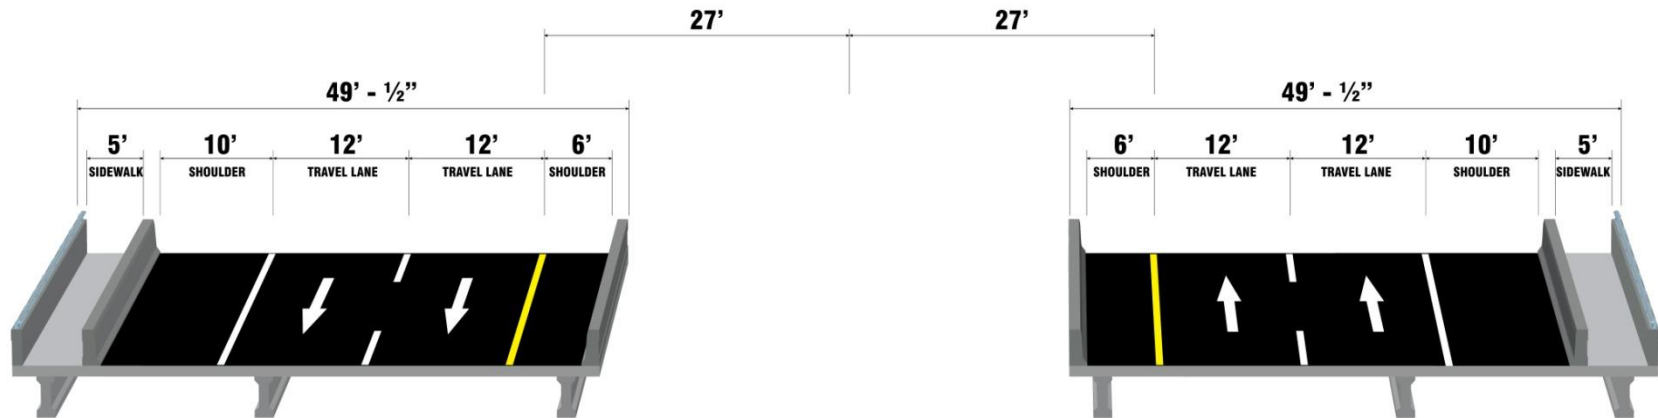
Proposed Ultimate Bridge Typical Sections
